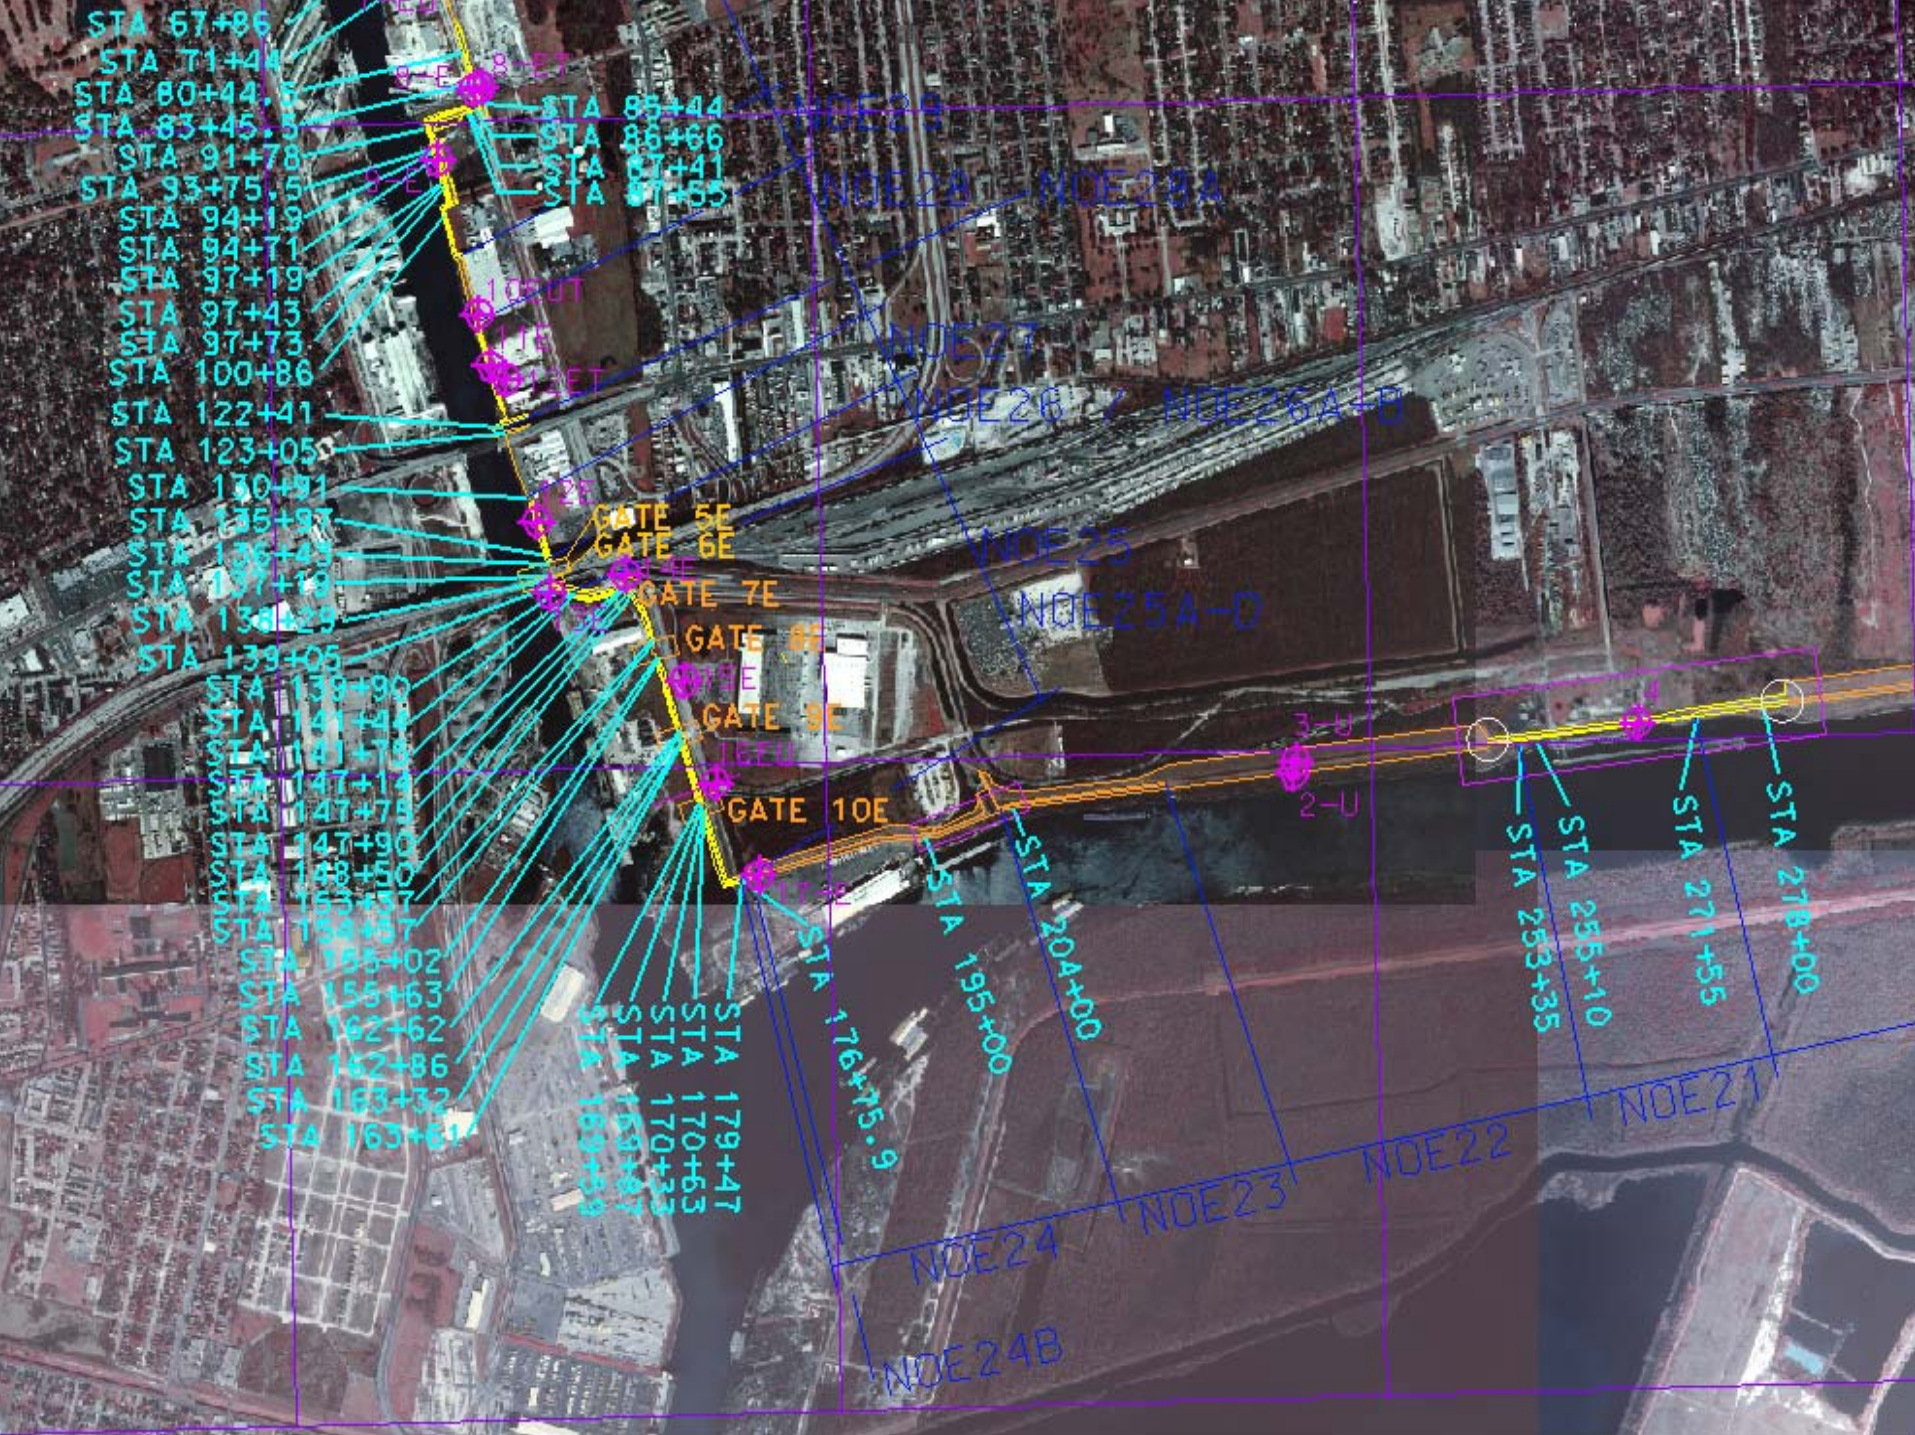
Floodwall Failure at East End of Michoud Canal FW
